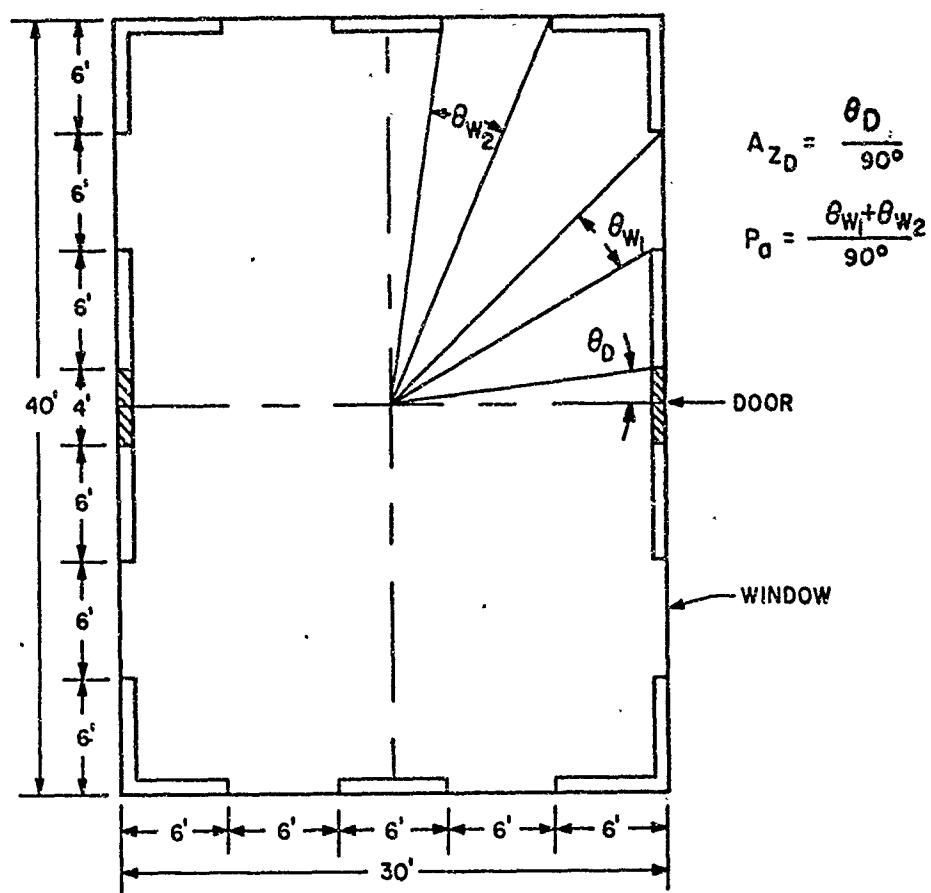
Plan of KSU test house showing azimuthal sectors for doors and windows.
